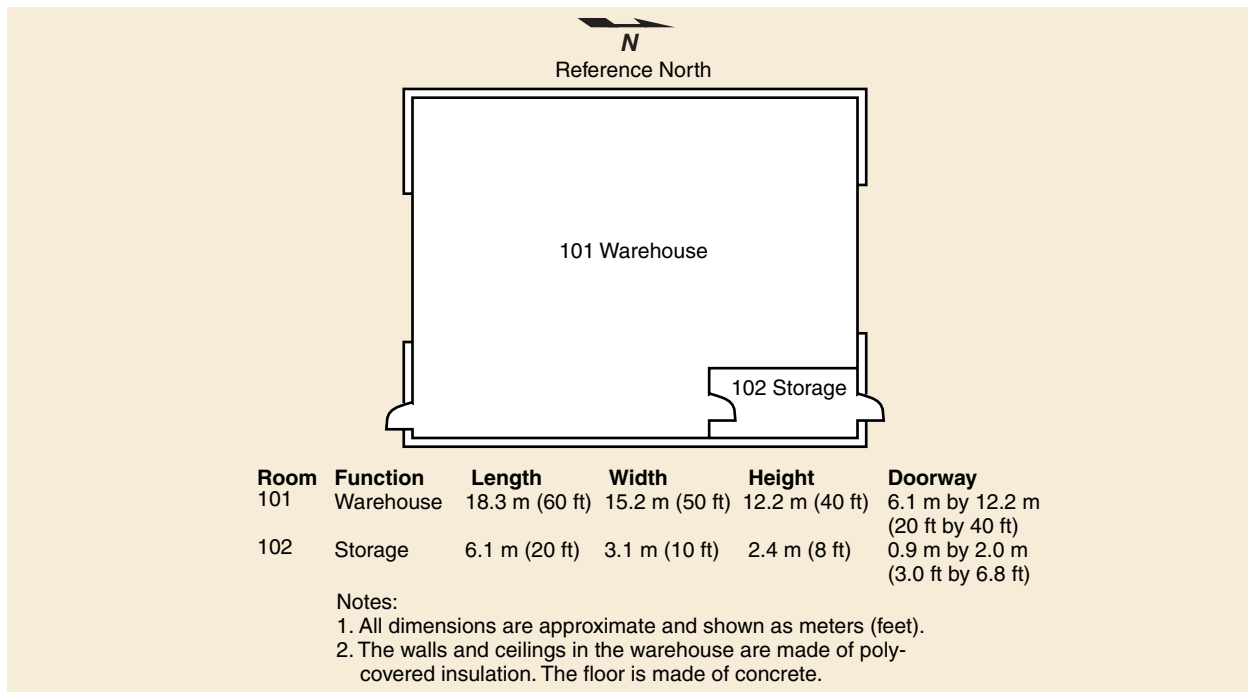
Building 6 Detailed Floor Plan, Astrotech
